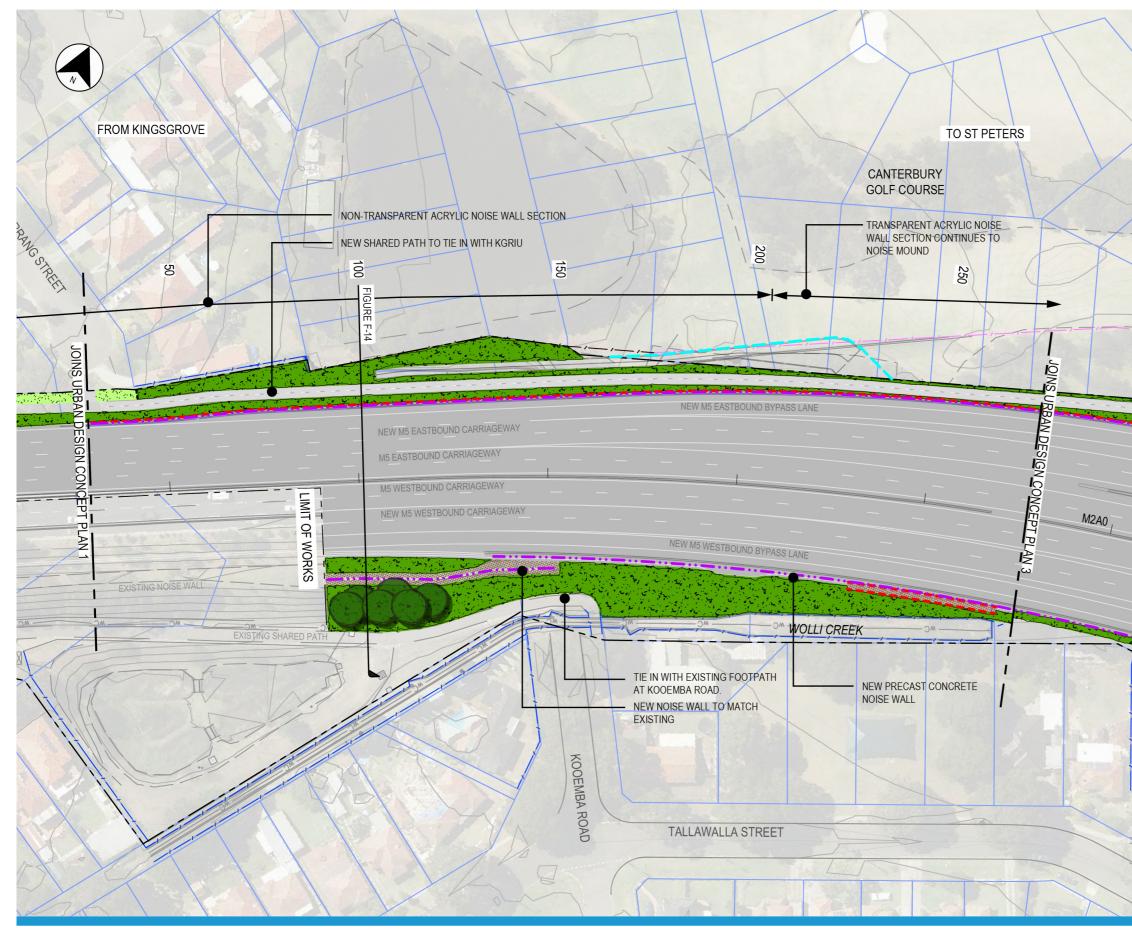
Western Interchange and Portals - Urban Design Concept Plan - Sheet 2 of 7 - 1:1000
